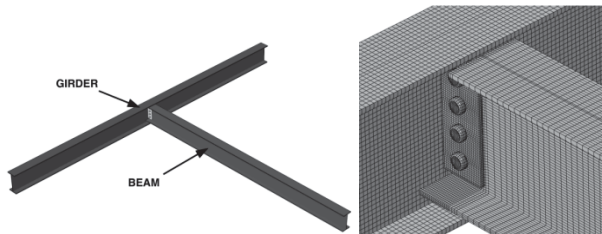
Finite element model of the (left) subassembly, (right) connection detail.
